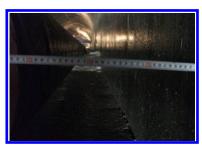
Silicon core pipe fastened to pipeline in rich water area
